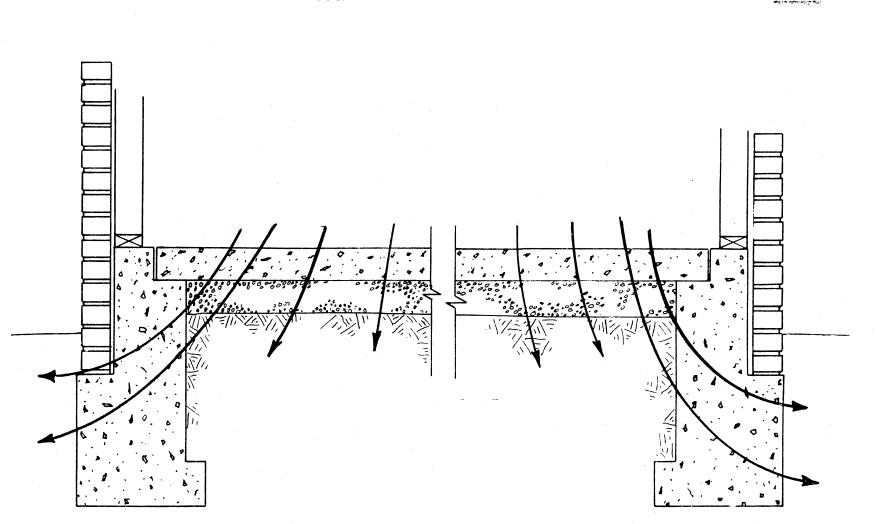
Heat Flow Patterns For Concrete Slab-on-Grade Floors
